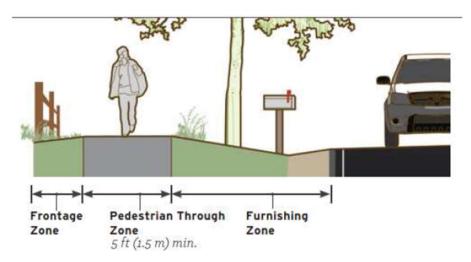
Typical sidewalk with grass strip (Source: FHWA)
